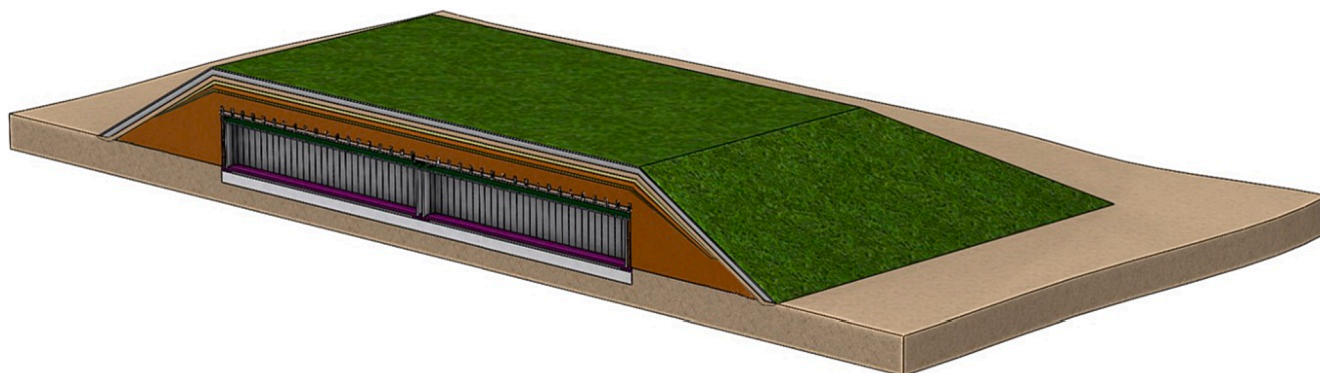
The repository with engineering barrier of 5.8 m thickness. Isometric view section.
